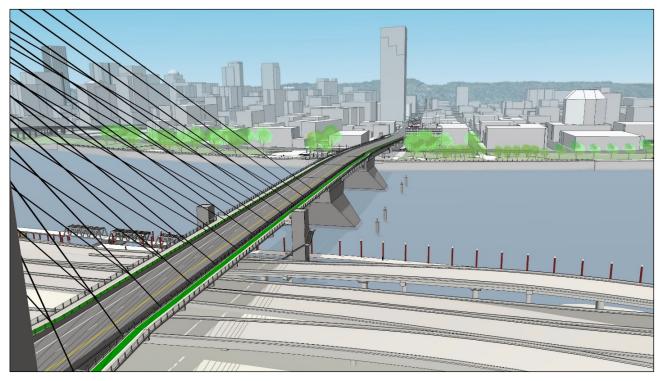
Span Combination 3 (girder west approach, bascule central span, cable supported east approach), artist's rendering, view looking southwest (Fat Pencil Studio, 2021).
